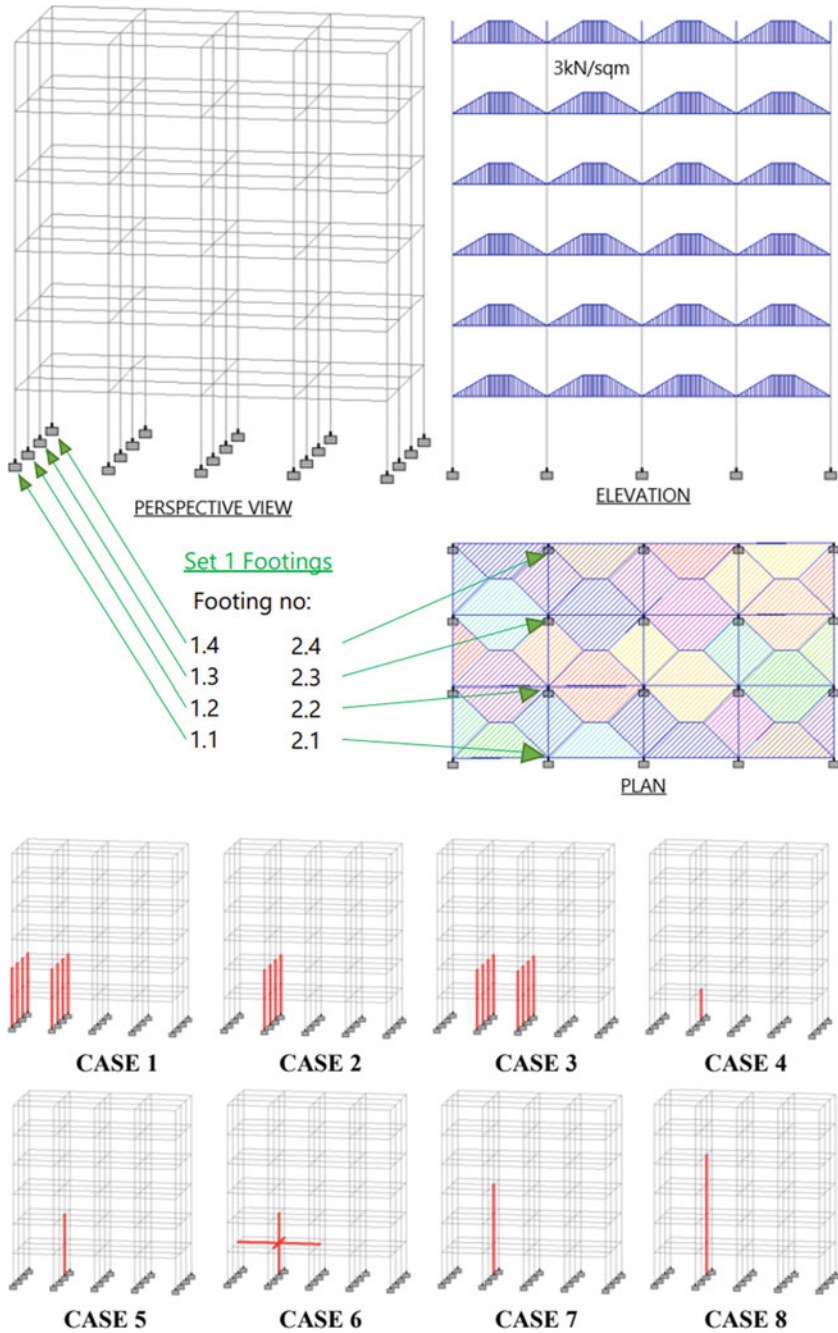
Structural model of multi-storey portal framed RCC structure, with loading condition. The 8 different cases of RC jacketing of columns are shown, jacketed columns in red
